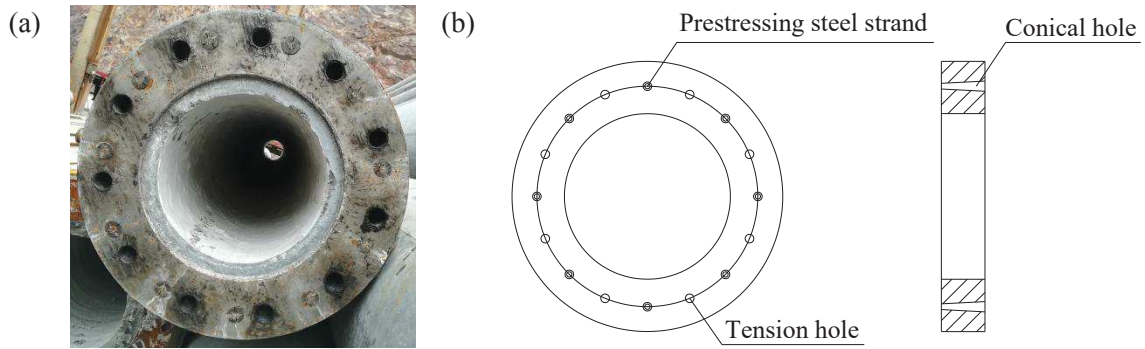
End plate for anchorage of pretensioned steel strands: (a) photo of end plate; (b) schematic diagram
